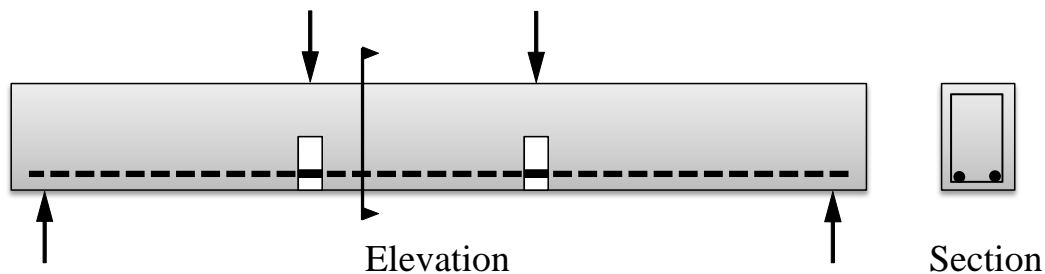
Typical beam anchorage specimen (ACI 408, 2003)
